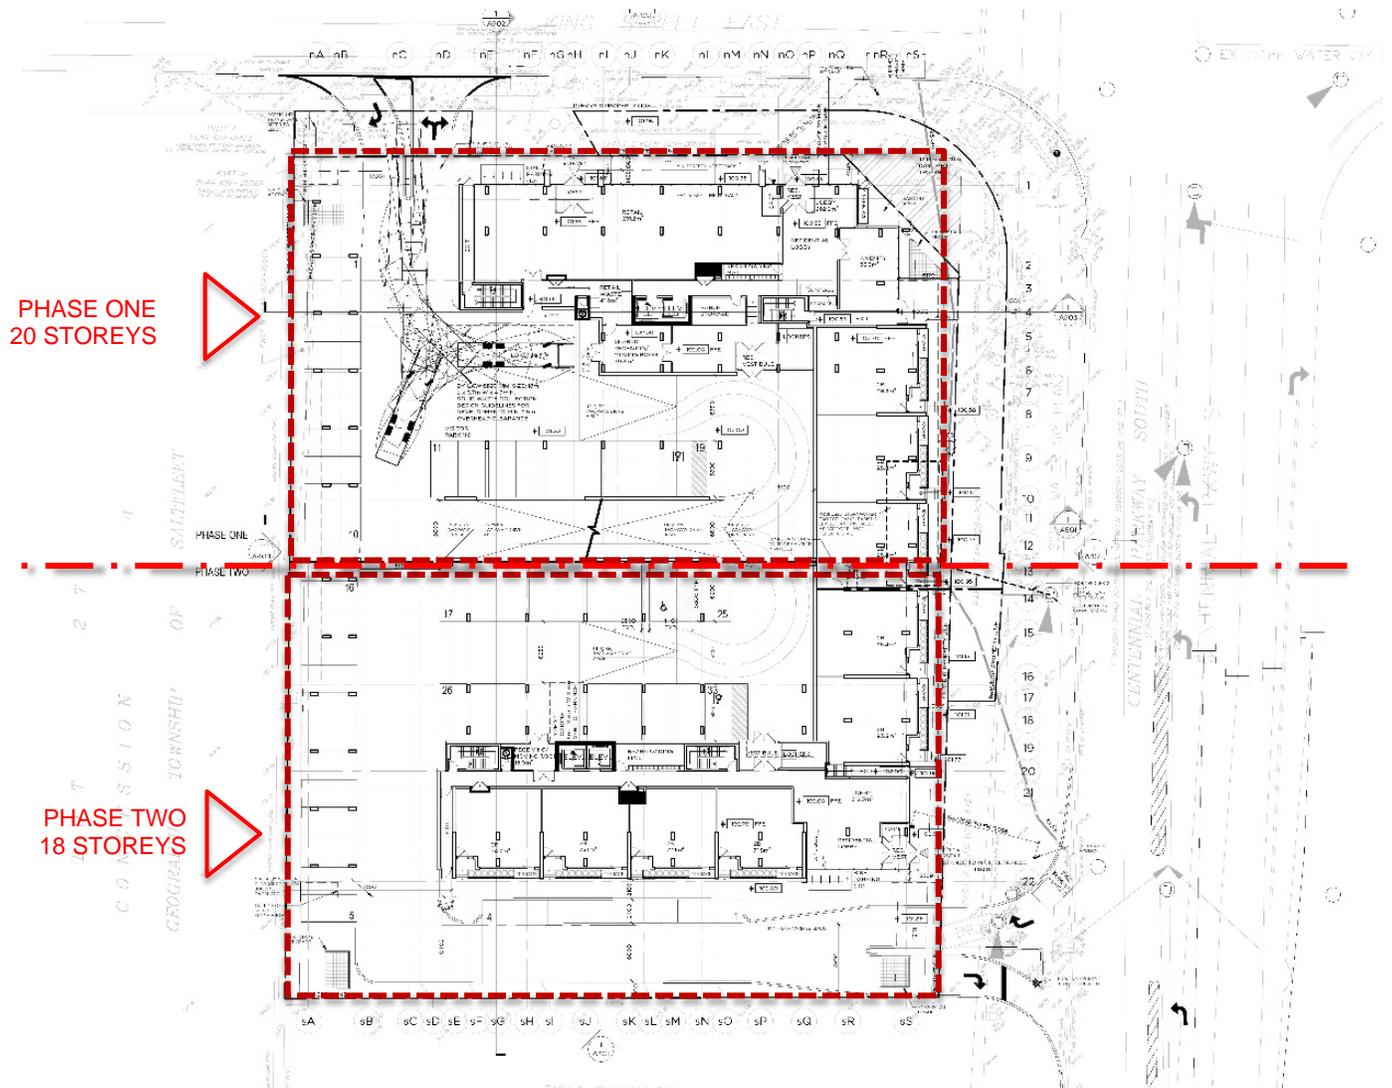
Proposed Ground Floor Plan of the new development at 2900 King St. E.
